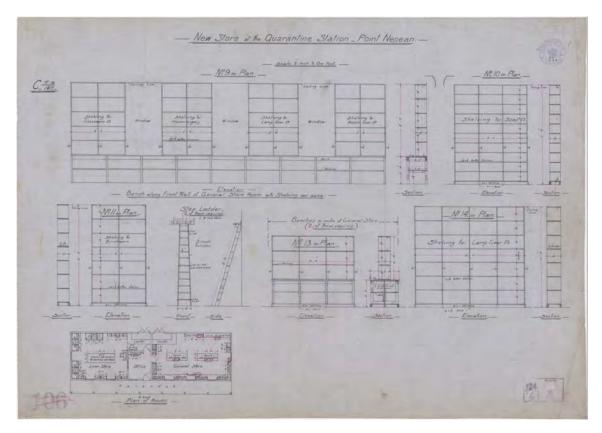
New Store at the Quarantine Station, Point Nepean. Floor plan and internal elevations, dated 17 May 1916. Source: National Archives of Australia.
